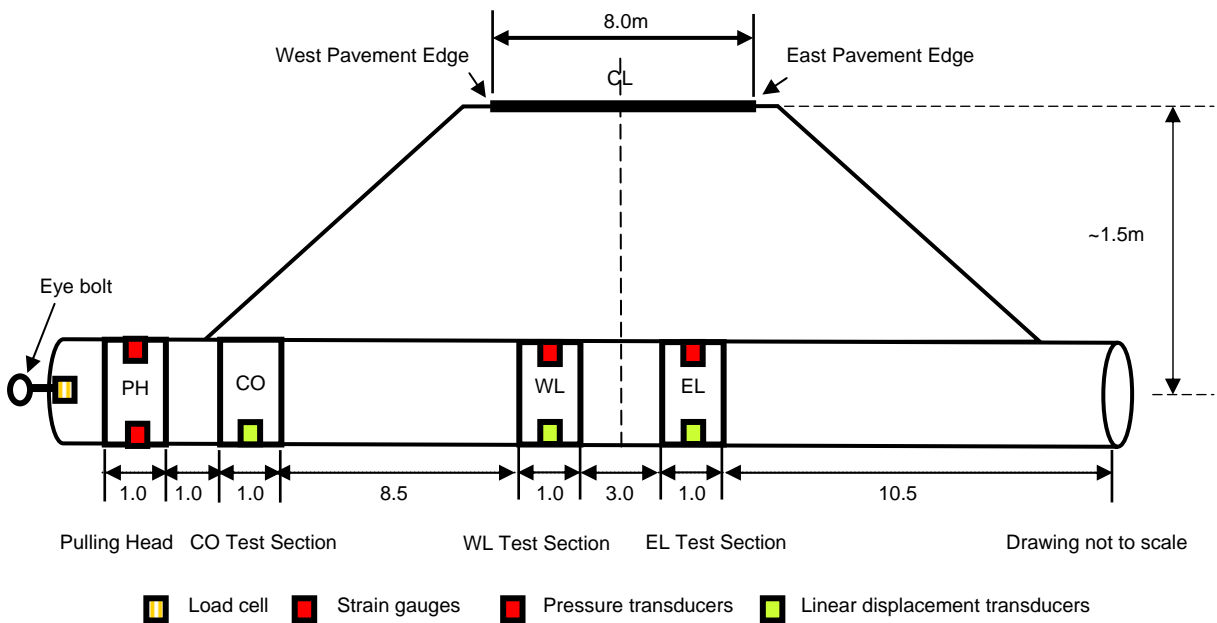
Layout of the sensors placed inside the HDD installed HDPE pipe.
